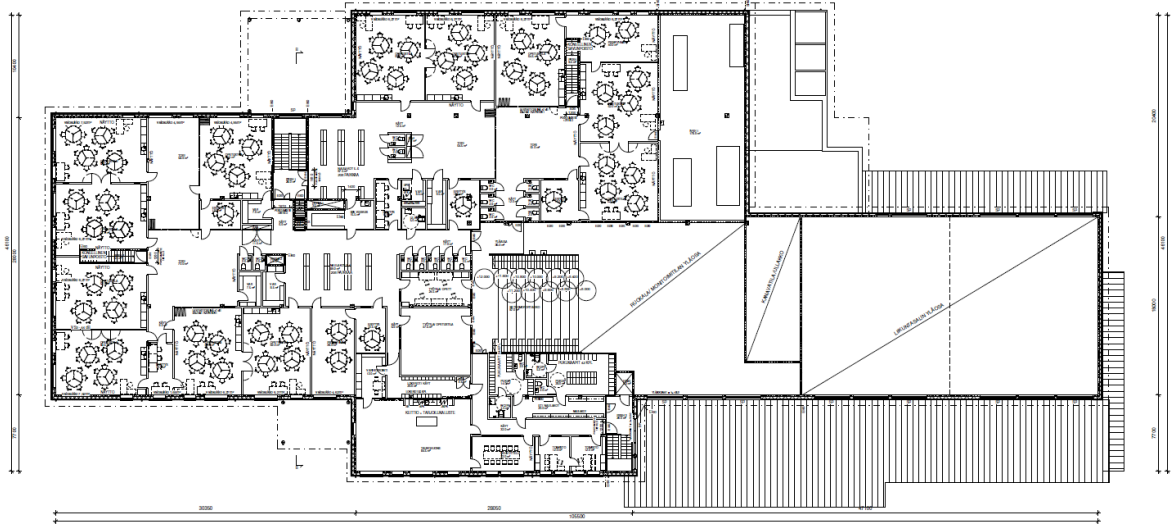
Floorplan of the second floor retrieved from the project bank 2020.
